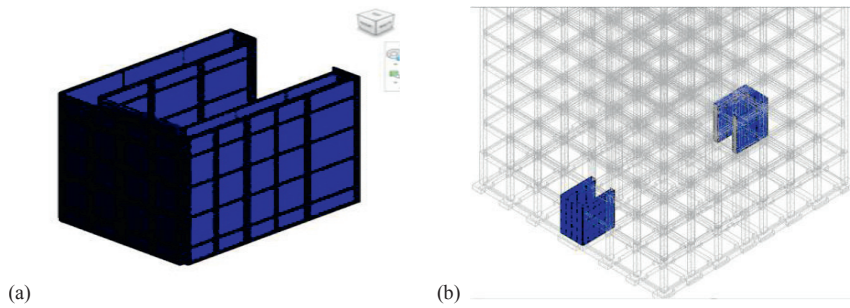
(a) 3D BIM Conventional wall formwork family file; (b) Importing the 3D BIM wall formwork family file into the wireframe model.
